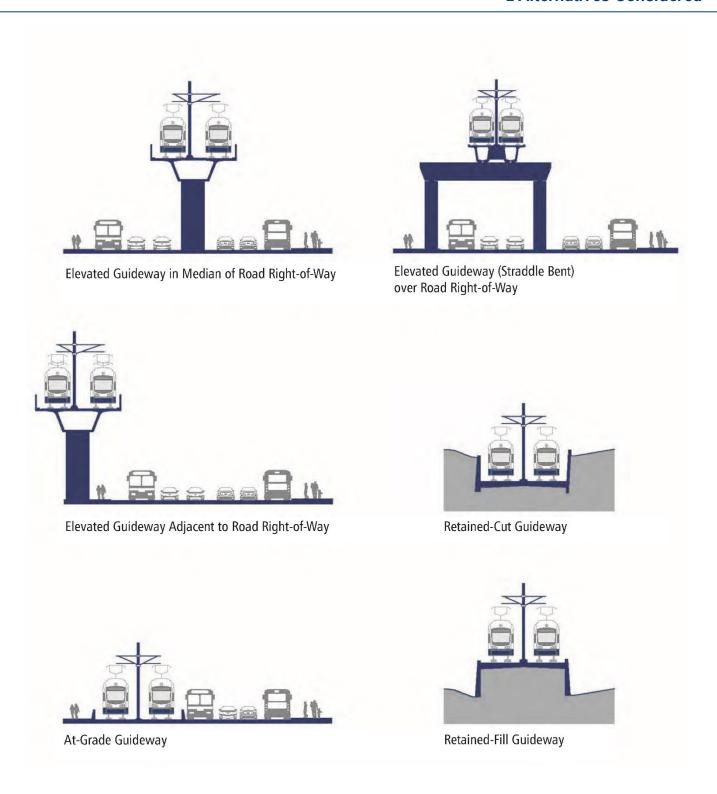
Typical Elevated, At-Grade, Retained-Cut, and Retained-Fill Guideway
